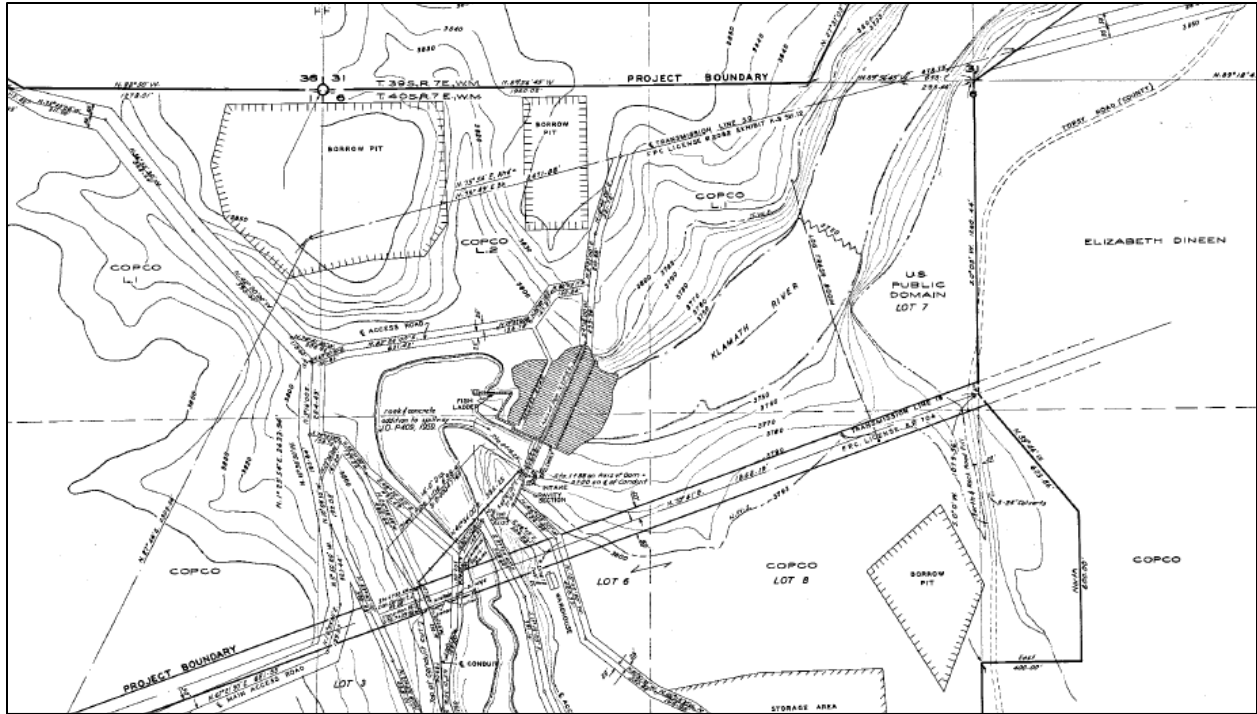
Site plan view of J.C. Boyle Dam showing topographic contours prior to dam construction
